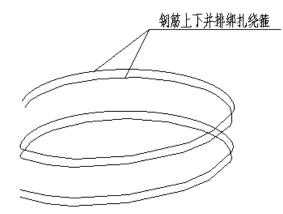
Bridge pier stirrup reinforcement design drawing (mm) (Translation: Steel bars are tied up and down side by side with hoops)
